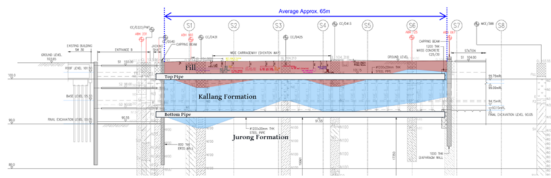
Envisaged Soil Profiles along Pipe Box Tunnel
